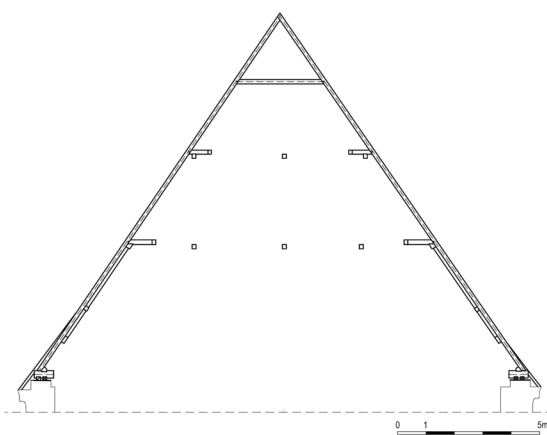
b. – Type I secondary truss in the roof structure of the Kogălniceanu street Reformed church, Cluj-Napoca
